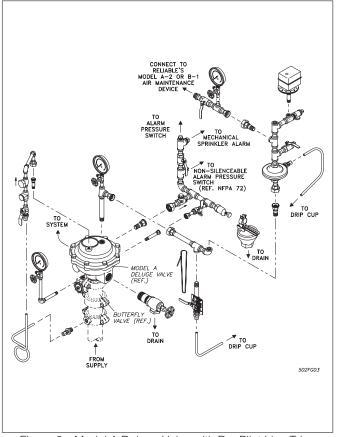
Model A Deluge Valve with Dry Pilot Line Trim, Preassembled
